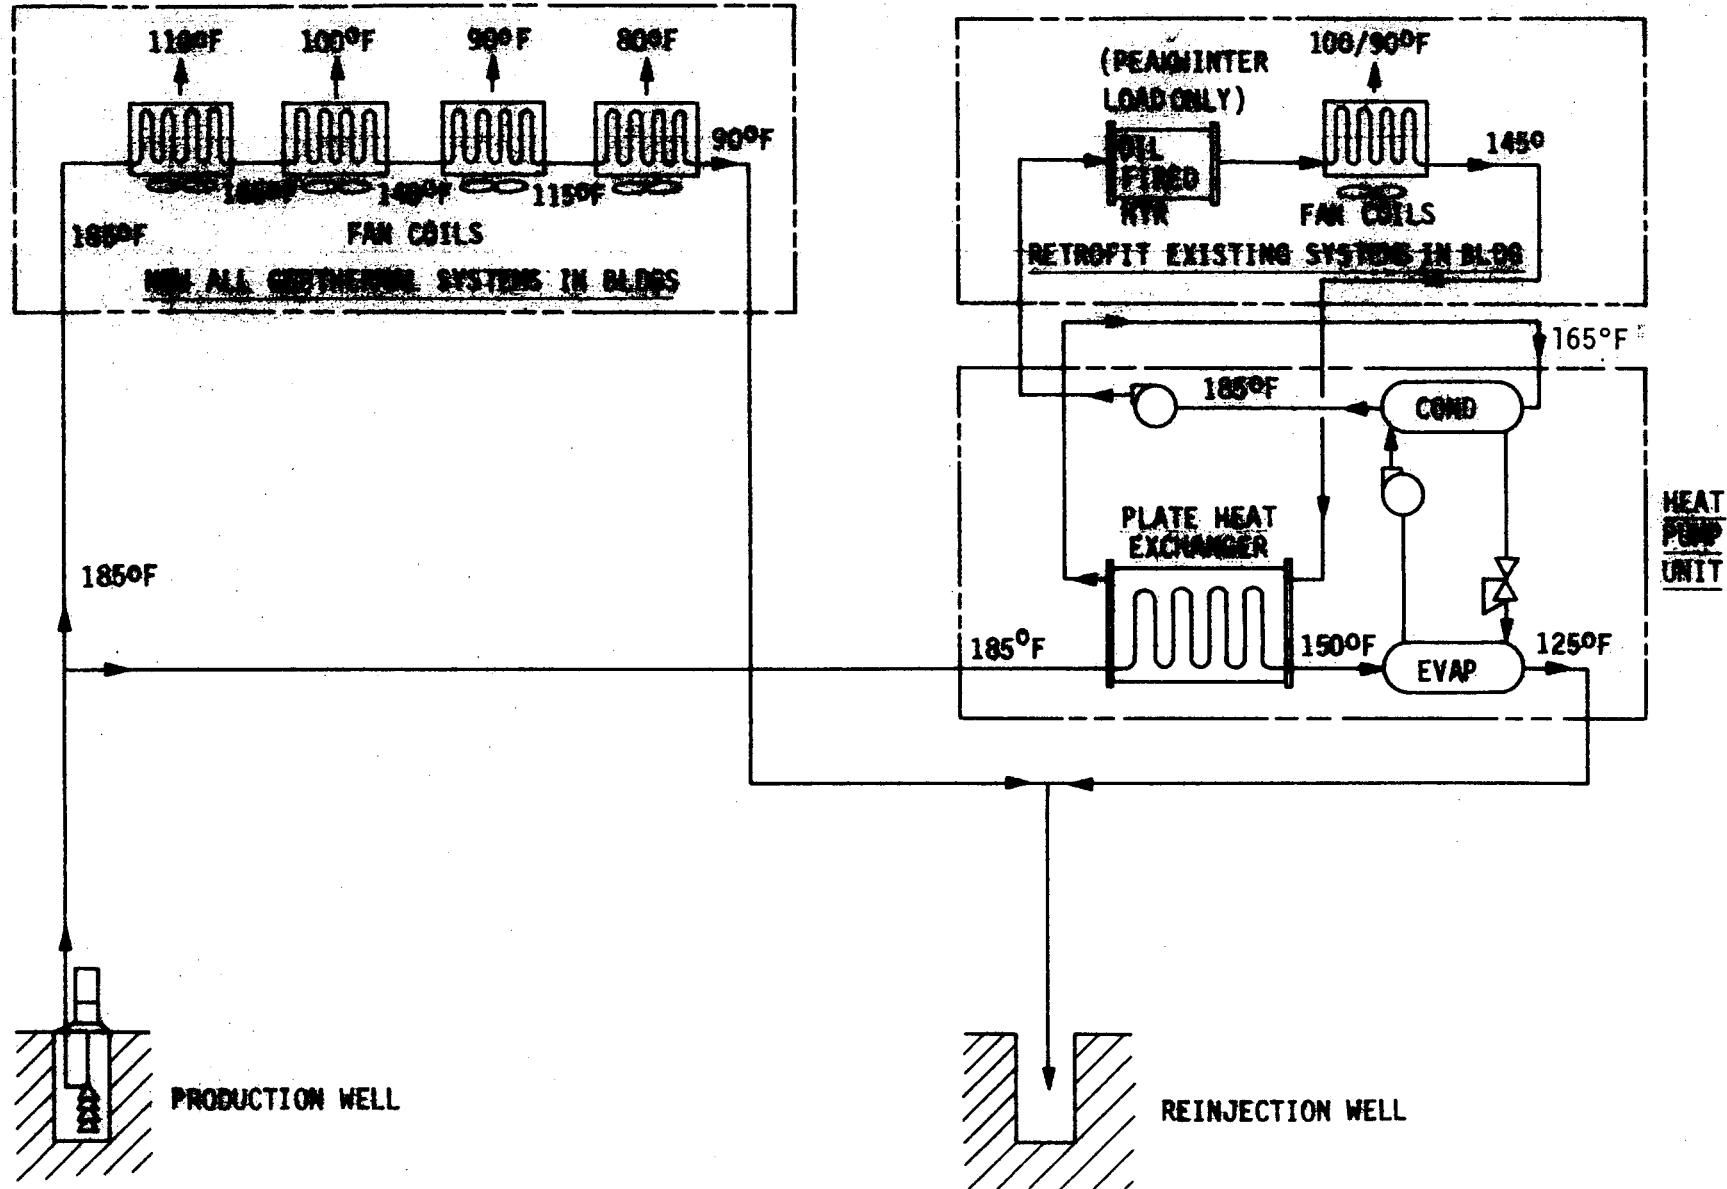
Integration of Heat Pump Into a Building with 185°F Geothermal Water
